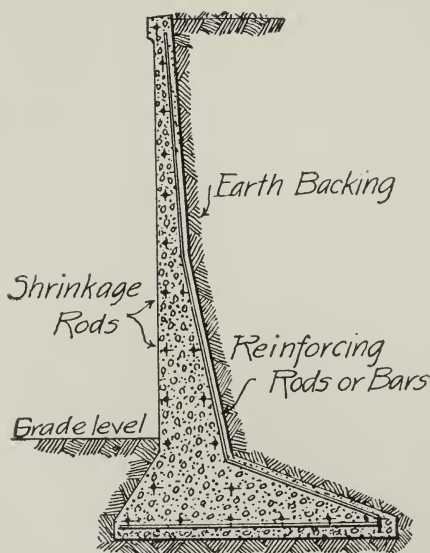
Section of Reinforced Concrete Retaining-Wall.
